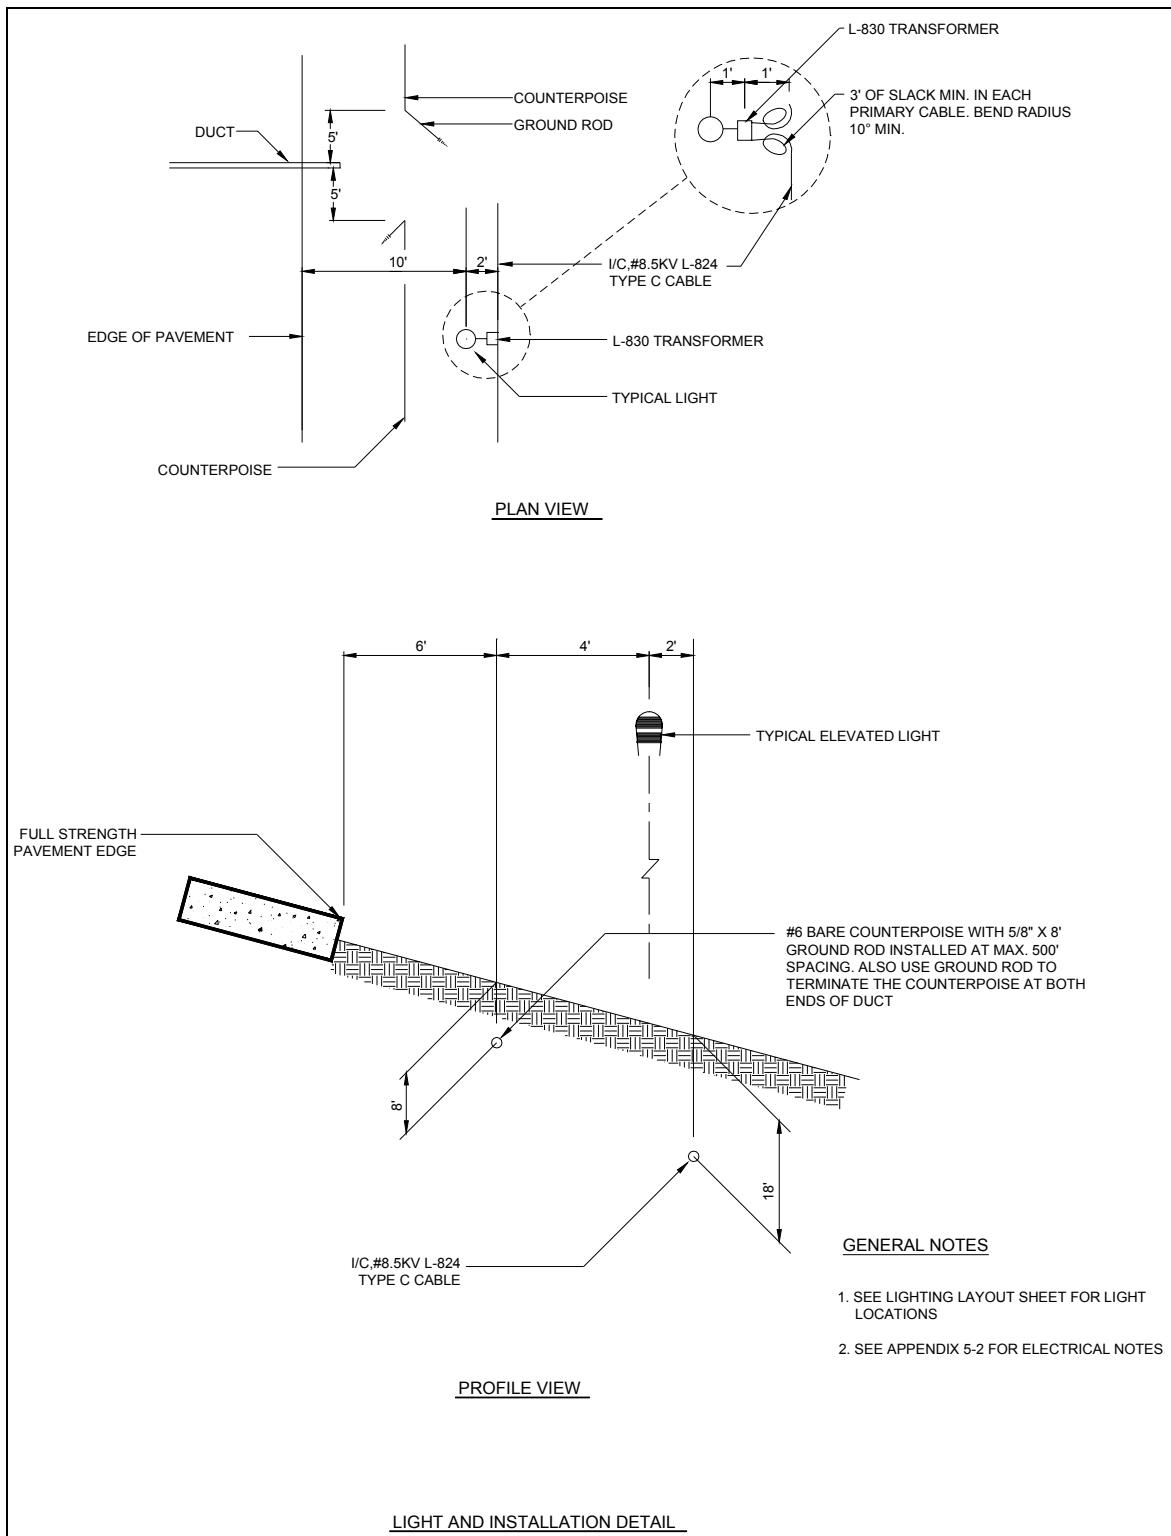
Typical Standard Details for Runway and Taxiway Edge Lights – GL-600 Sheet 1F – Light & Installation Detail
